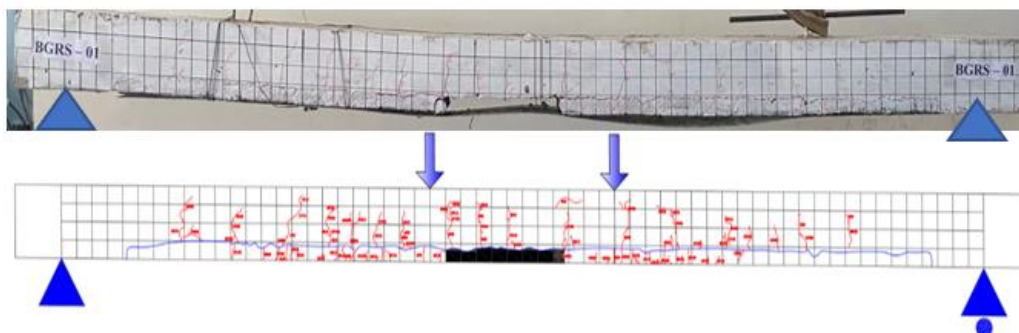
Crack Pattern of RBGS Concrete Beams
